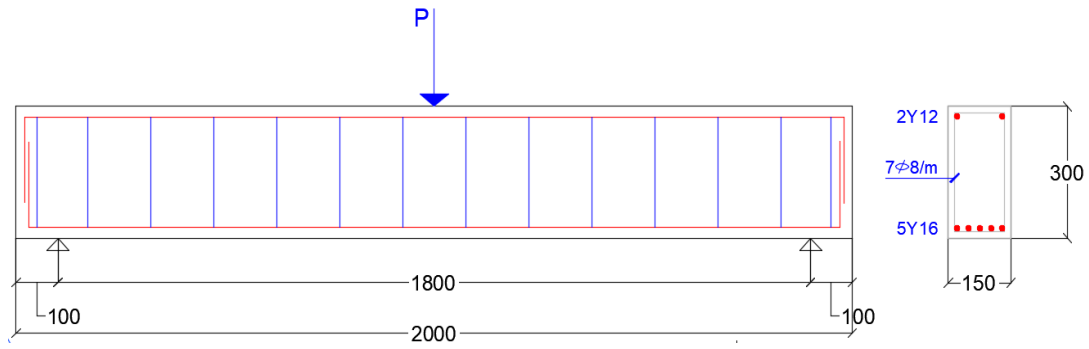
Details of tested Beams Group 2 (Shear failure beams) in mm.
